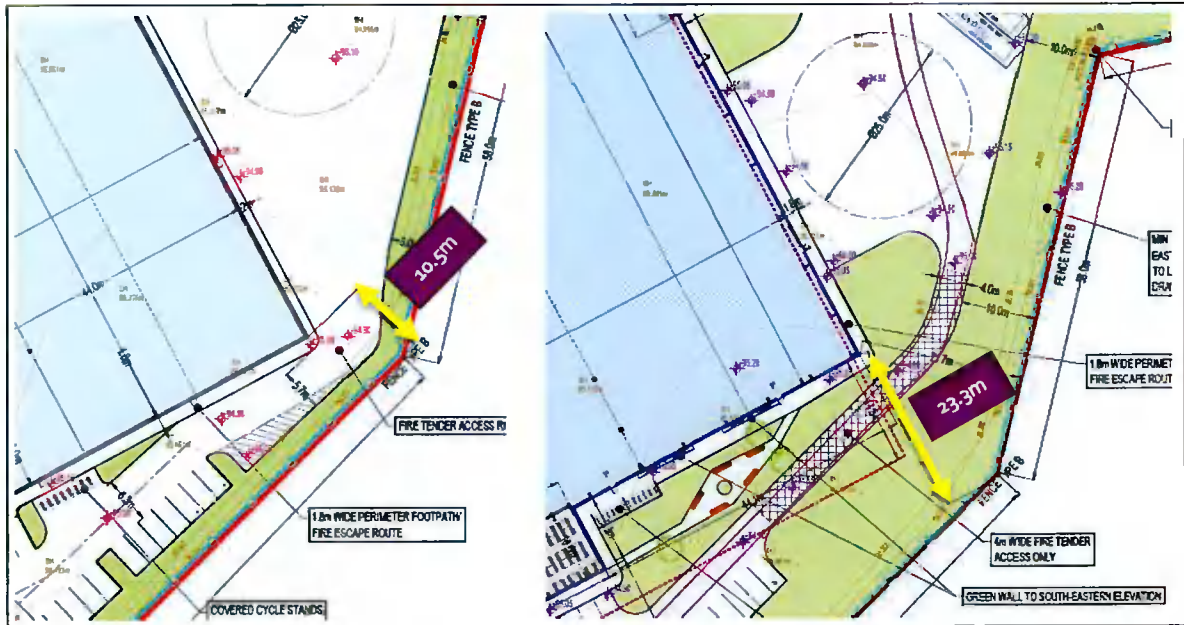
Extract from the Previously Proposed Site Plan (Left) and the Now Proposed Site Plan (Right)
